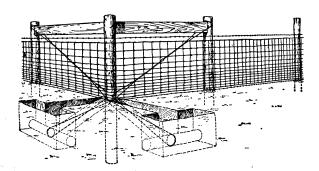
A good corner-post bracing using deadmen anchors for brace wires.
